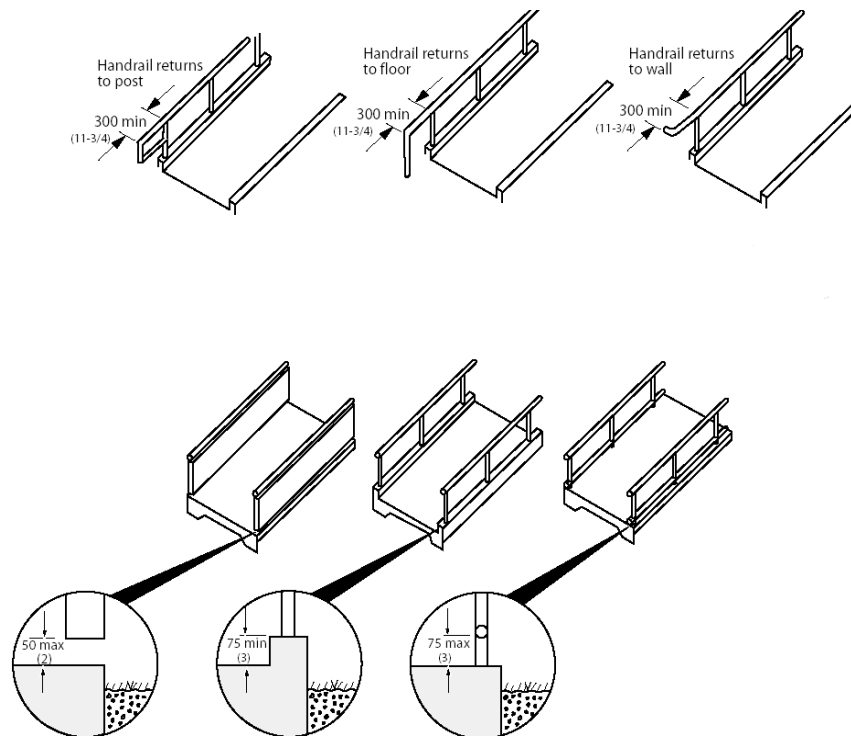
Horizontal Handrail Extensions and Edge Protection at Ramps (Facilities Accessibility Design Standards, 2007)
